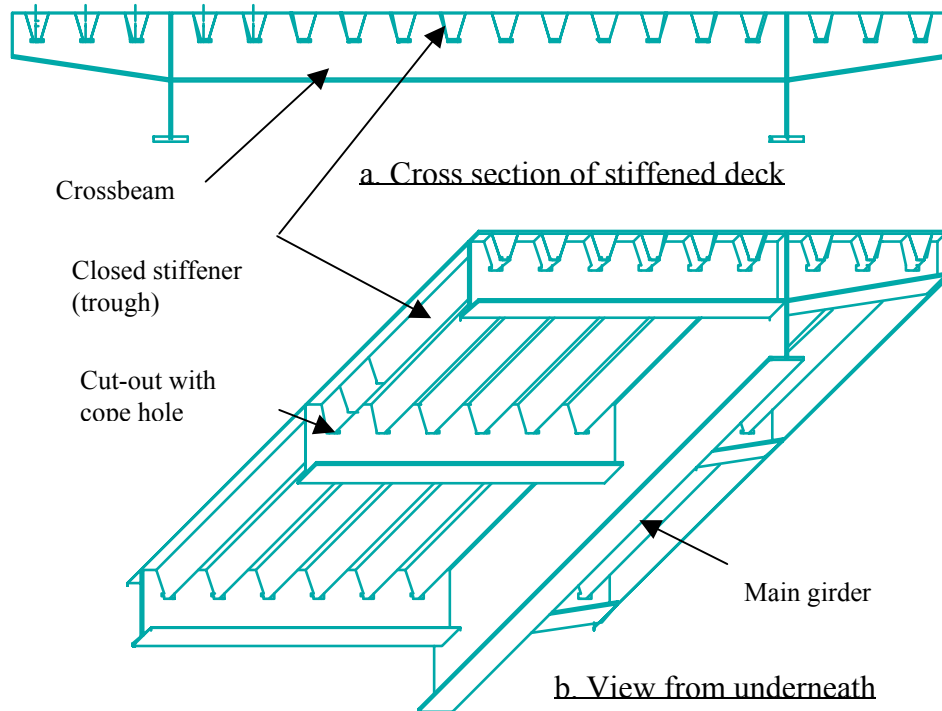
Orthotropic steel deck with crossbeams and main girder
